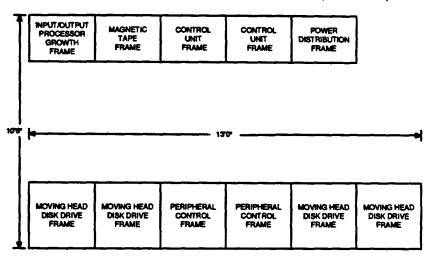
Typical 3B20D Model 1 Computer Floor Plan
